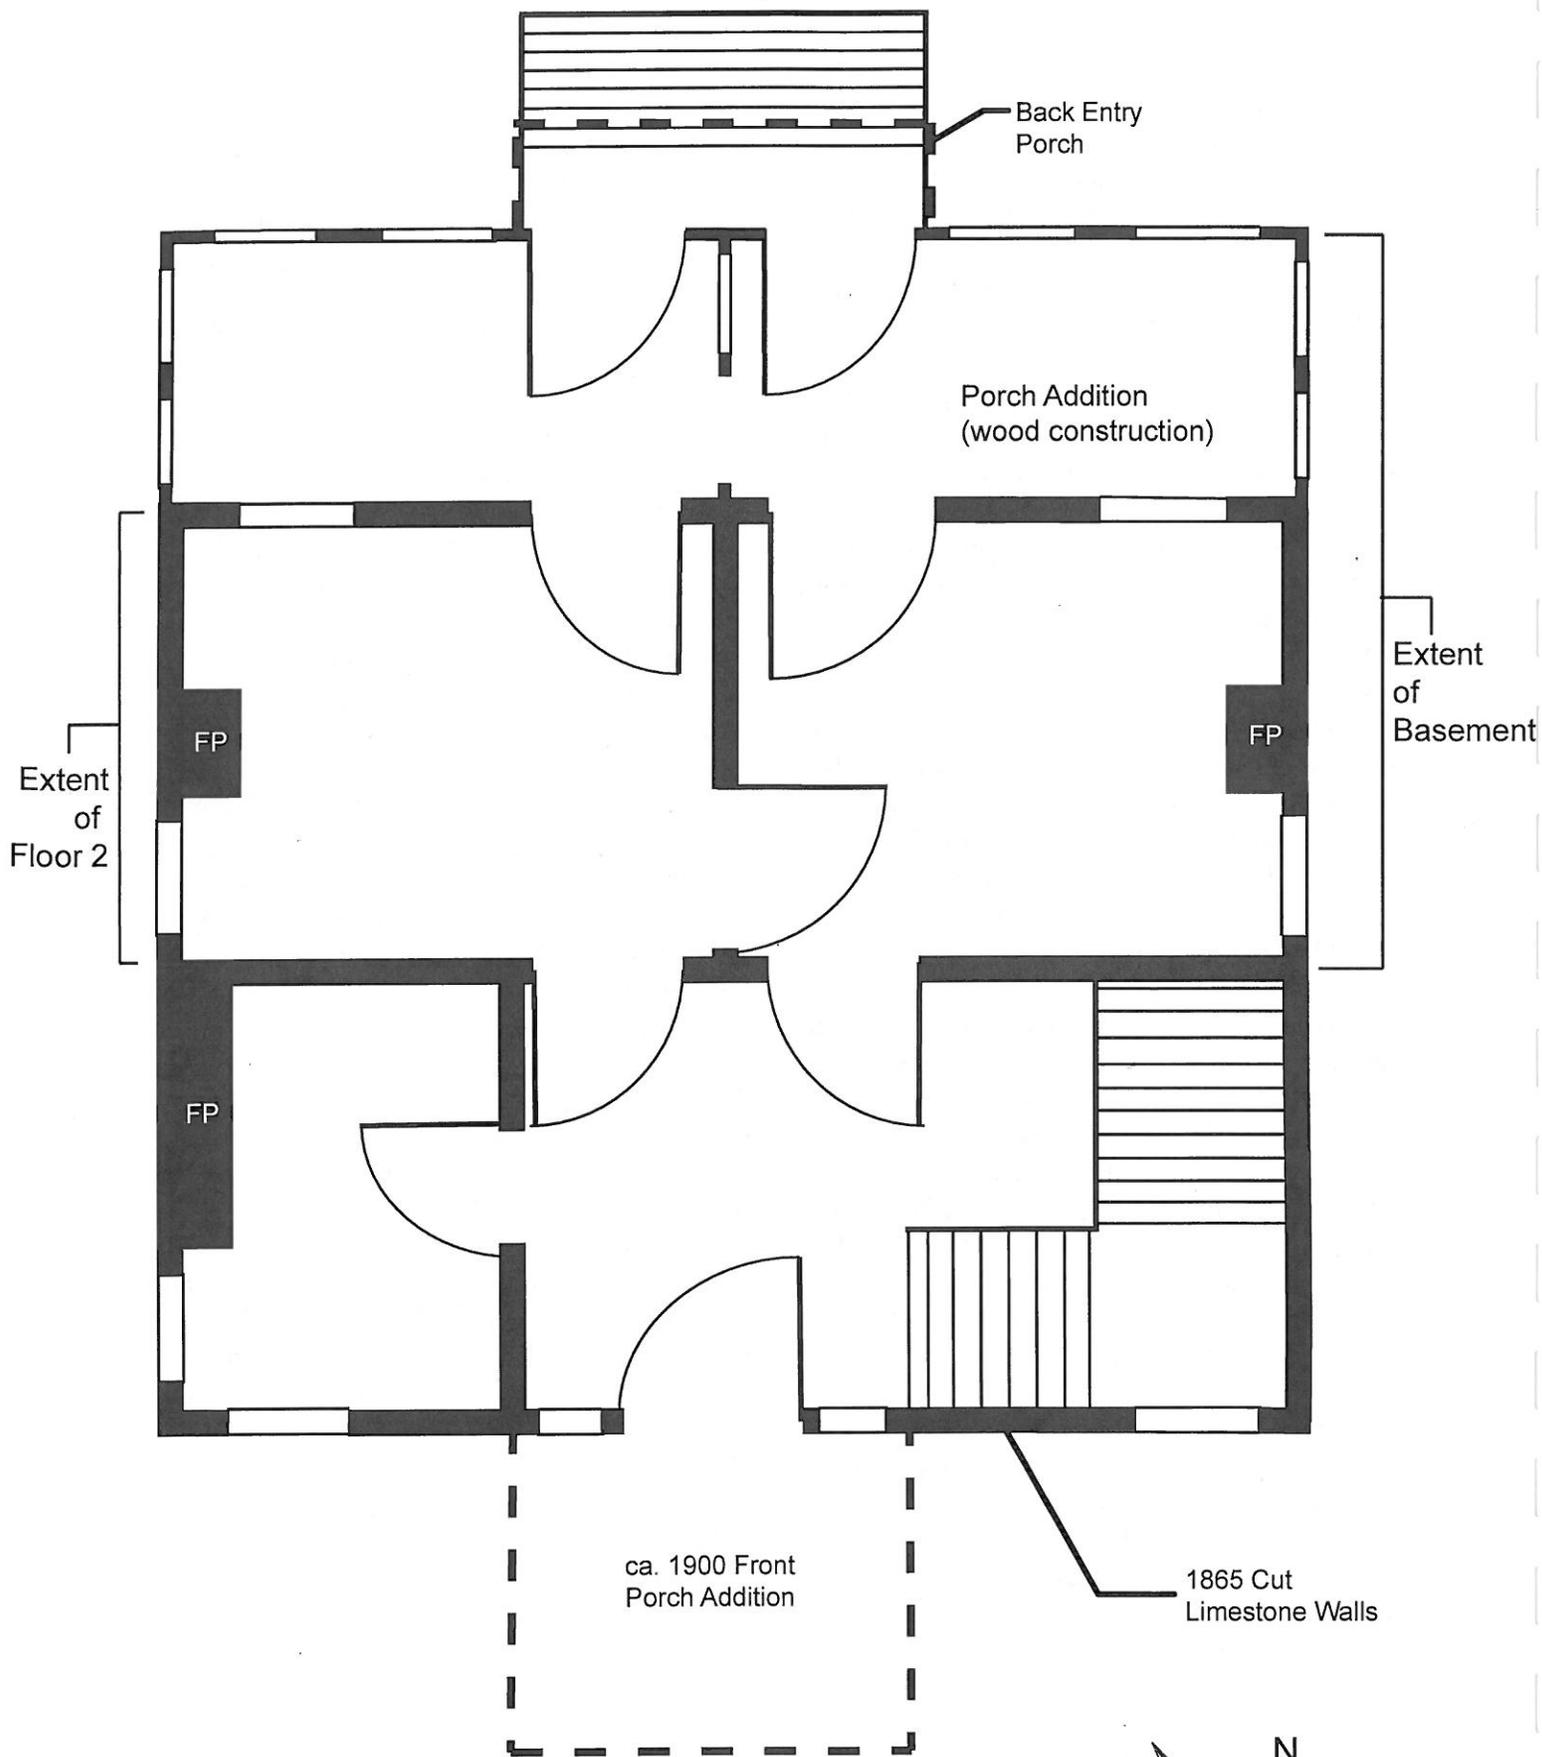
Ground Floor Plan 1865 House - Kinder Ranch
